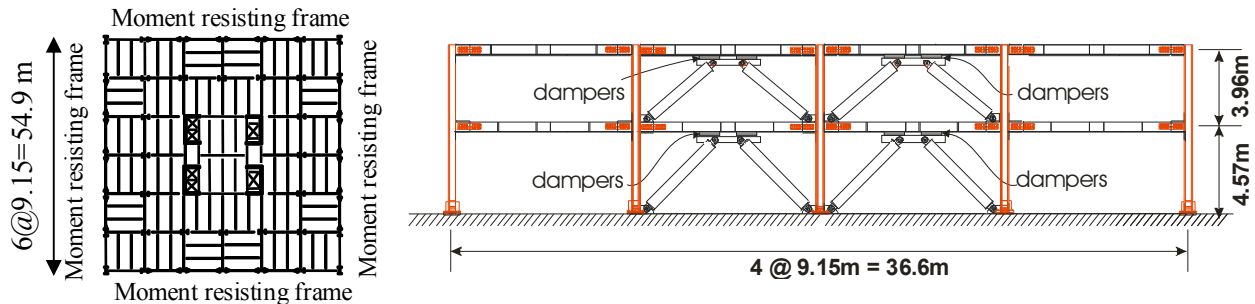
Prototype building structure: (a) plan view, and (b) perimeter MRF with dampers and supporting bracing
